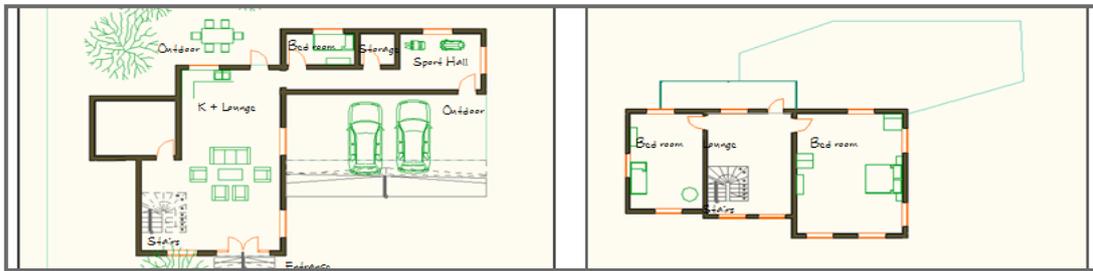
Ground and first floor plans for one students' initial design (Source: (By AutoCAD)).
